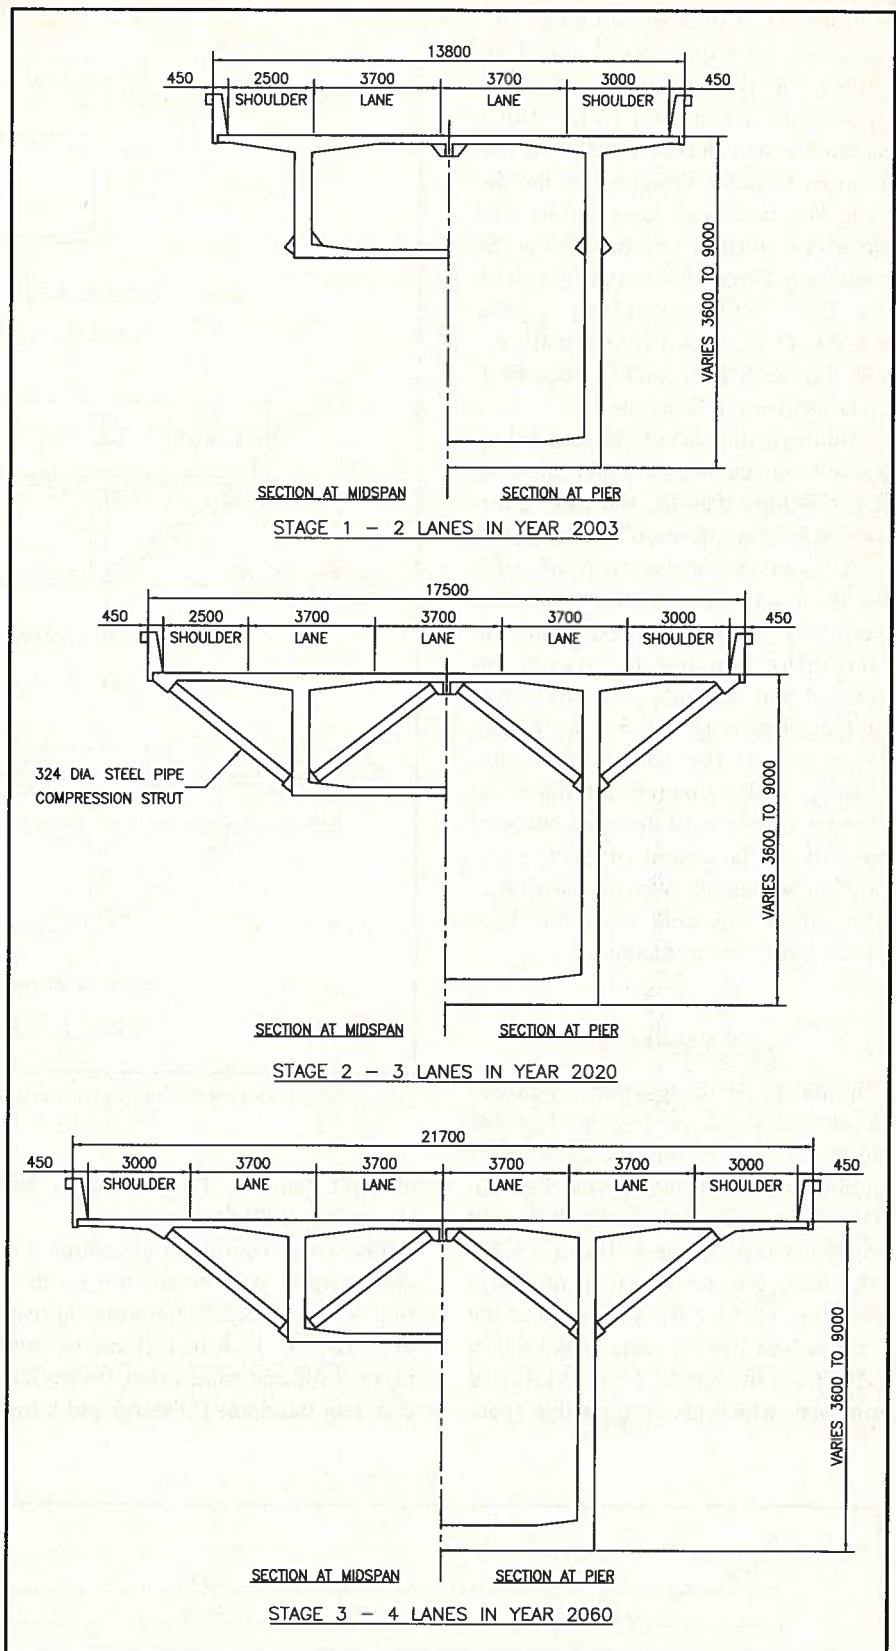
Cross section widening for variable-depth bridge (Example 1).
